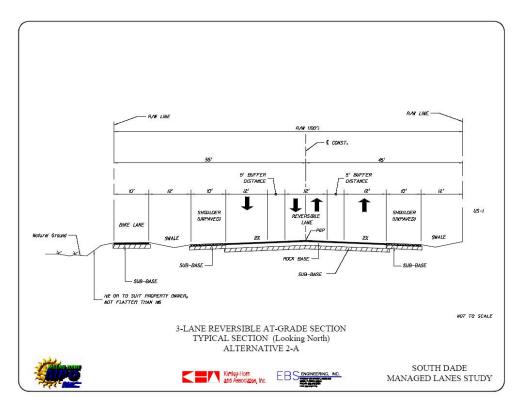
Typical Cross Section of the Three-Lane Alternative
